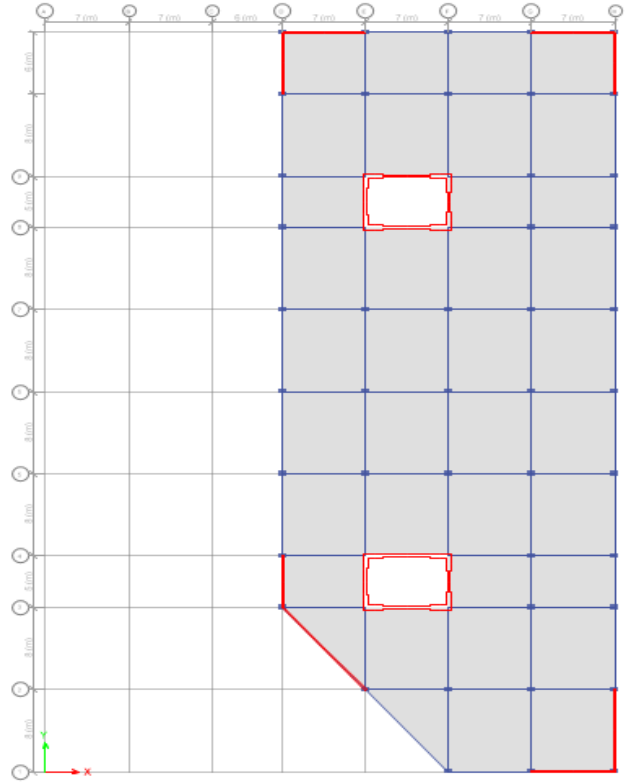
Typical Floor Plan: from 13 to 21 story level : Shear wall At Corner portion
